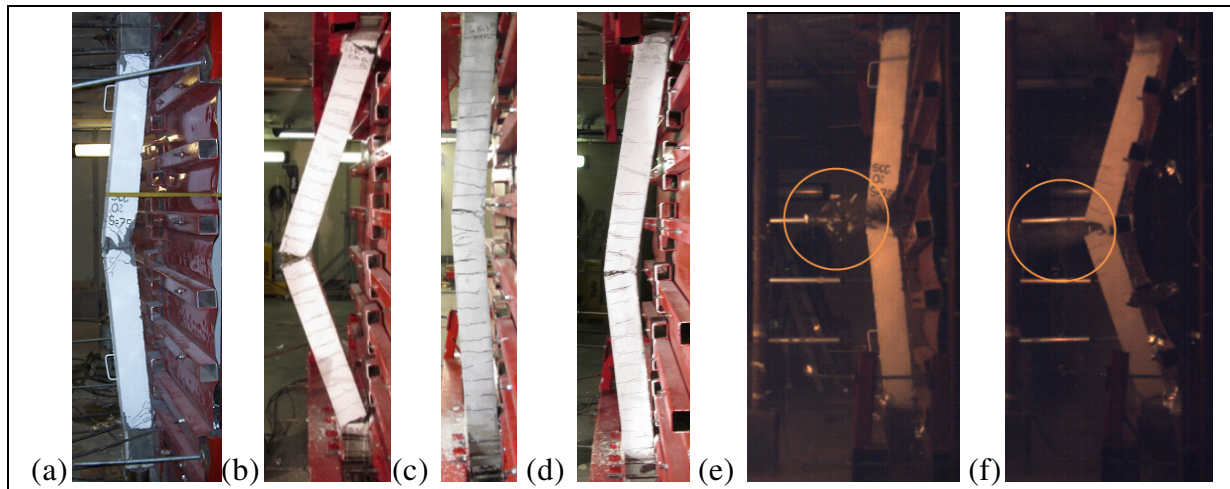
(a) Damage in column SCC-0%-75 at failure [Blast 3], (b) damage in column CRC-2%B-75 at failure [Blast 4], (c) damage in column CRC-2%B-75-6#3-HS at failure [Blast 4], (d) damage in column CRC-2%B-75-15M at failure [Blast 4(2)], (e) video still of column SCC-0%-75 at Blast 3 and (f) video still of column CRC-2%A-75 at Blast 4.
